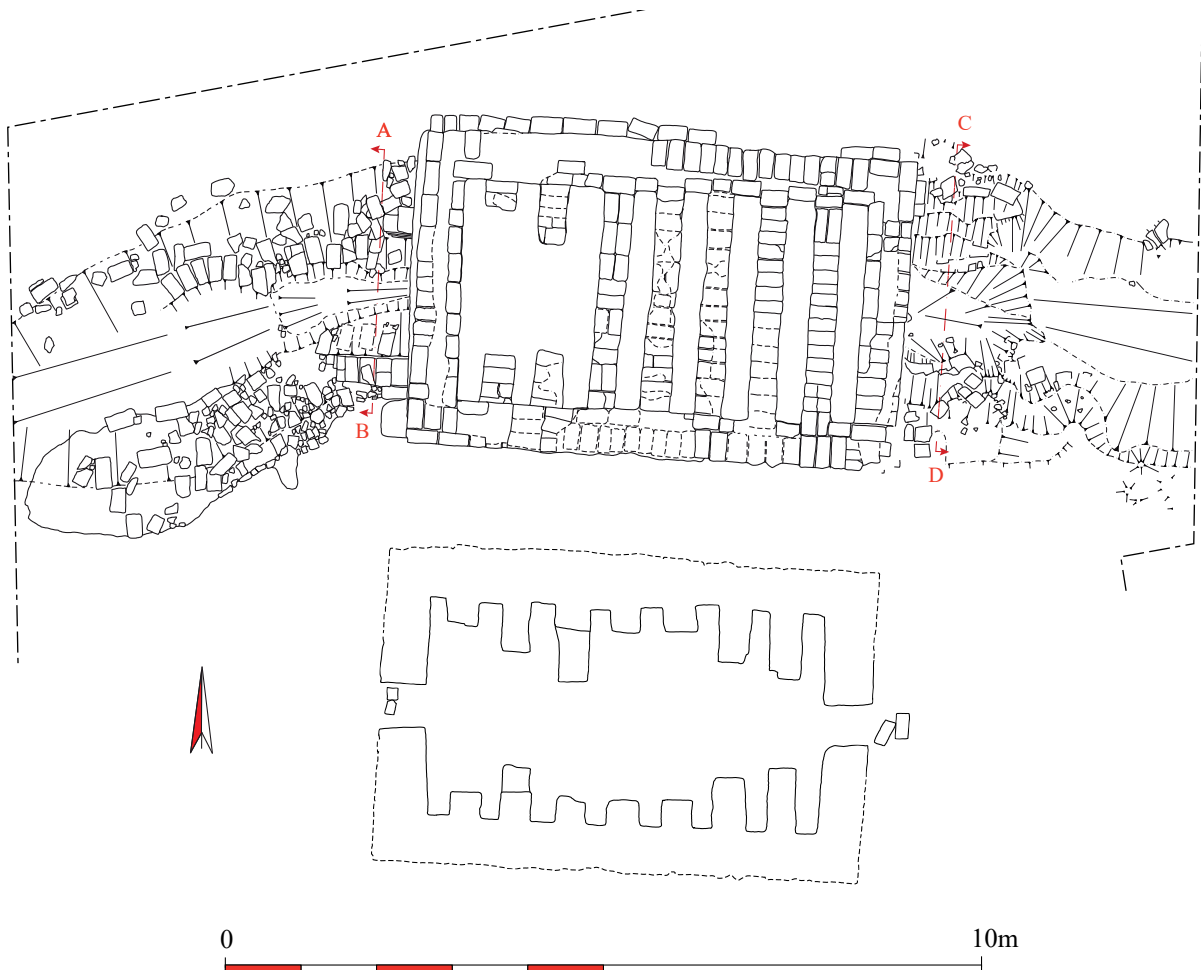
Building F3. Top and bottom plans (scale 1:100).
